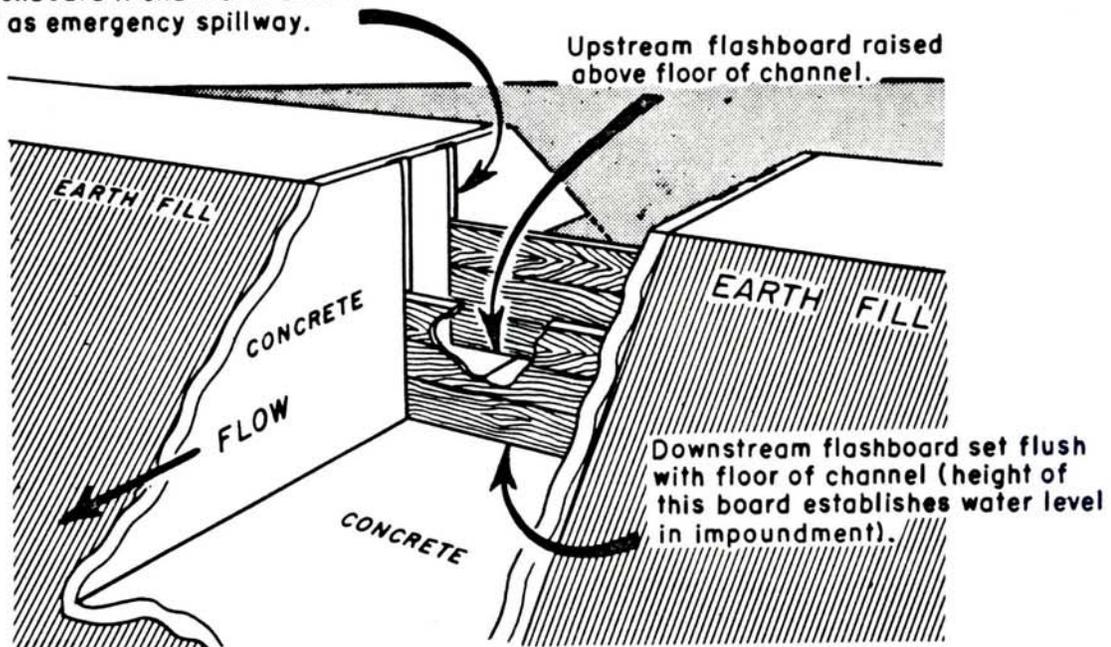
Double Flashboard Installed in Concrete Spillway.
